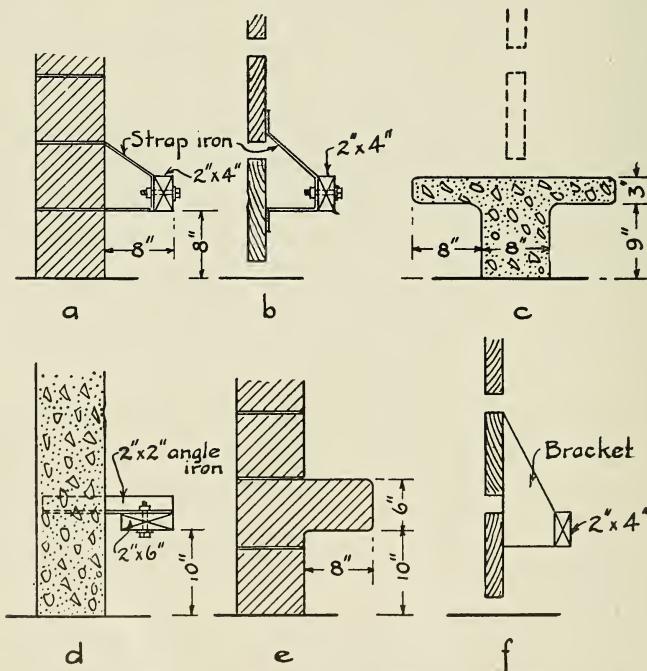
Several Types of Fenders or Guard Rails suggested for use in concrete hog houses.
